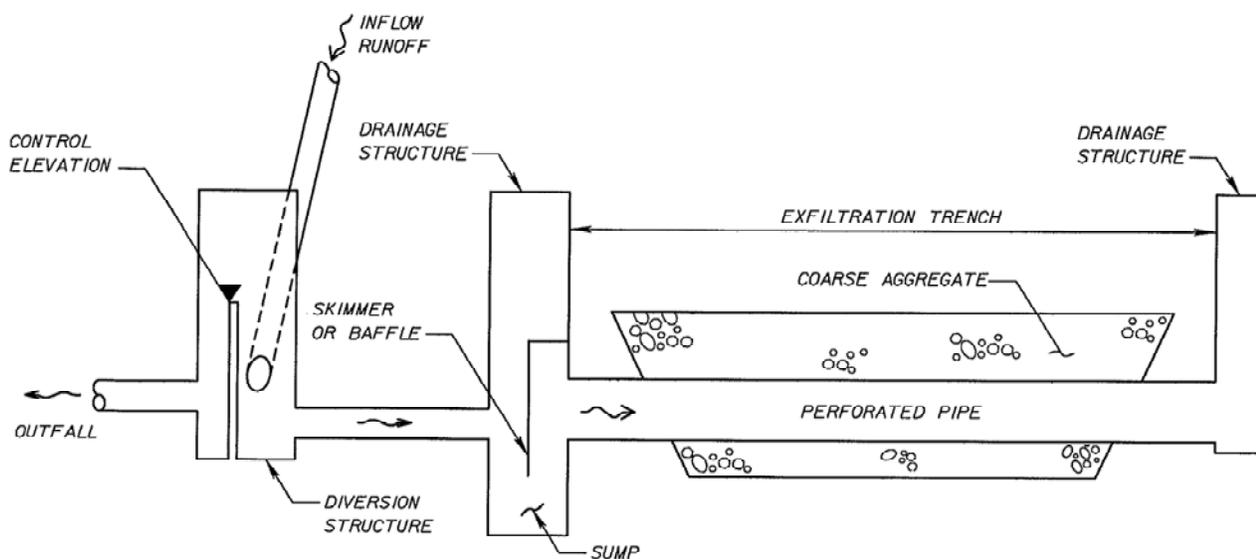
(A) OFF-LINE EXFILTRATION SYSTEM.
